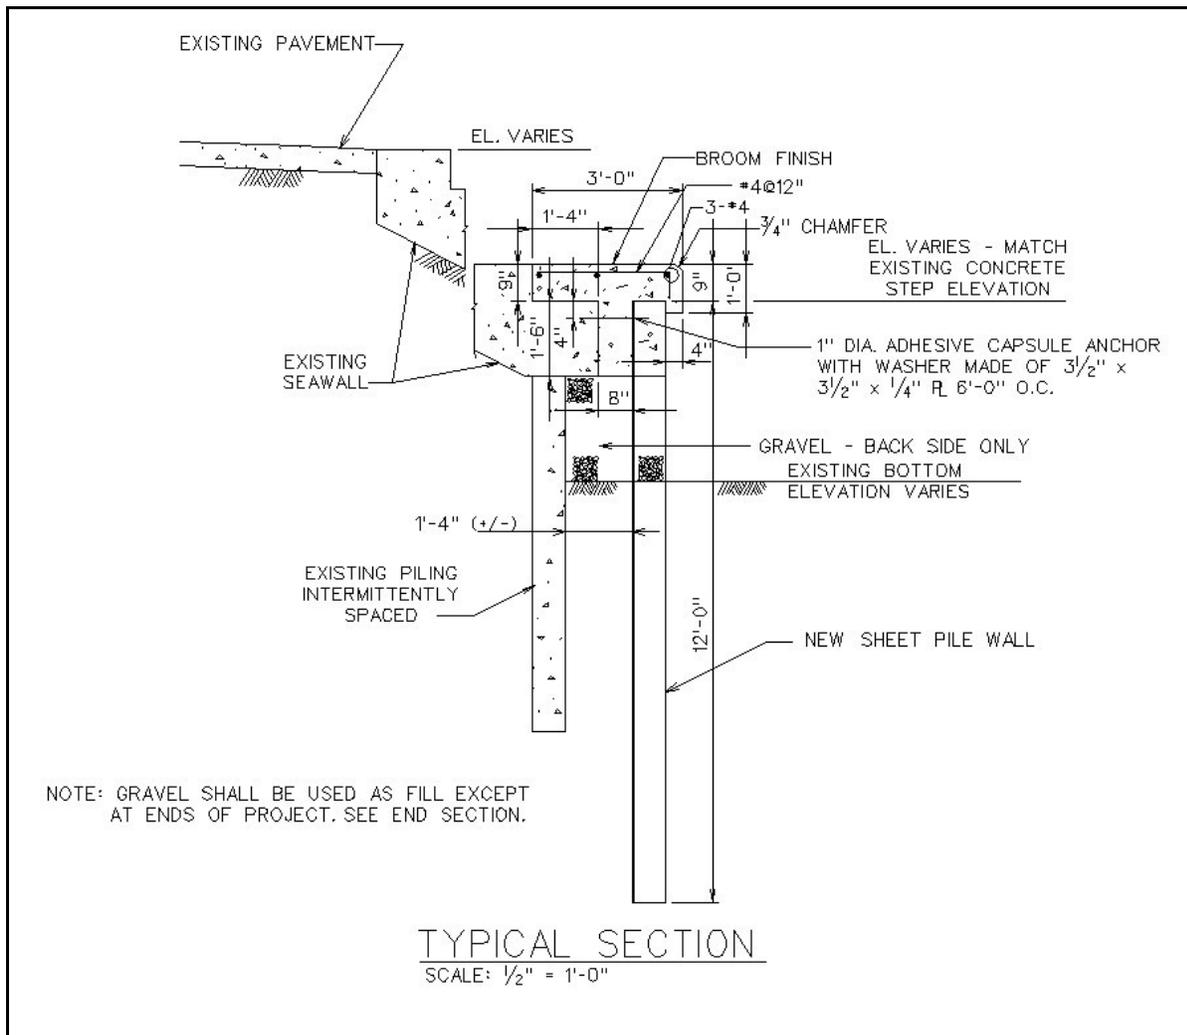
Arrangement for Steel and Vinyl Sheetpile Alternatives
